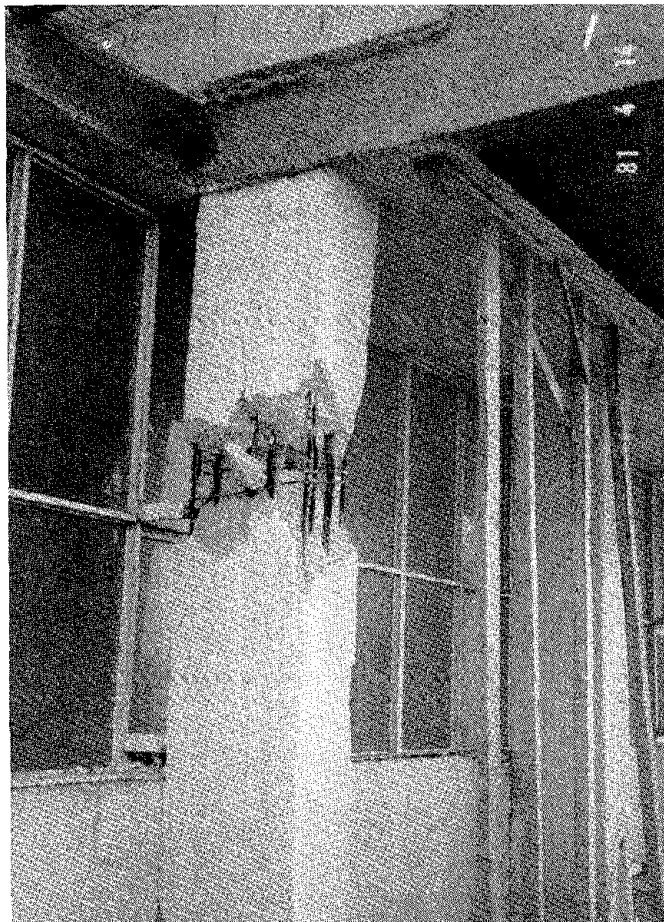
Typical case of damage to construction joint in the block of flats in Loutraki. Various kinds of rubbish were found in these joints in addition to steel and concrete.
